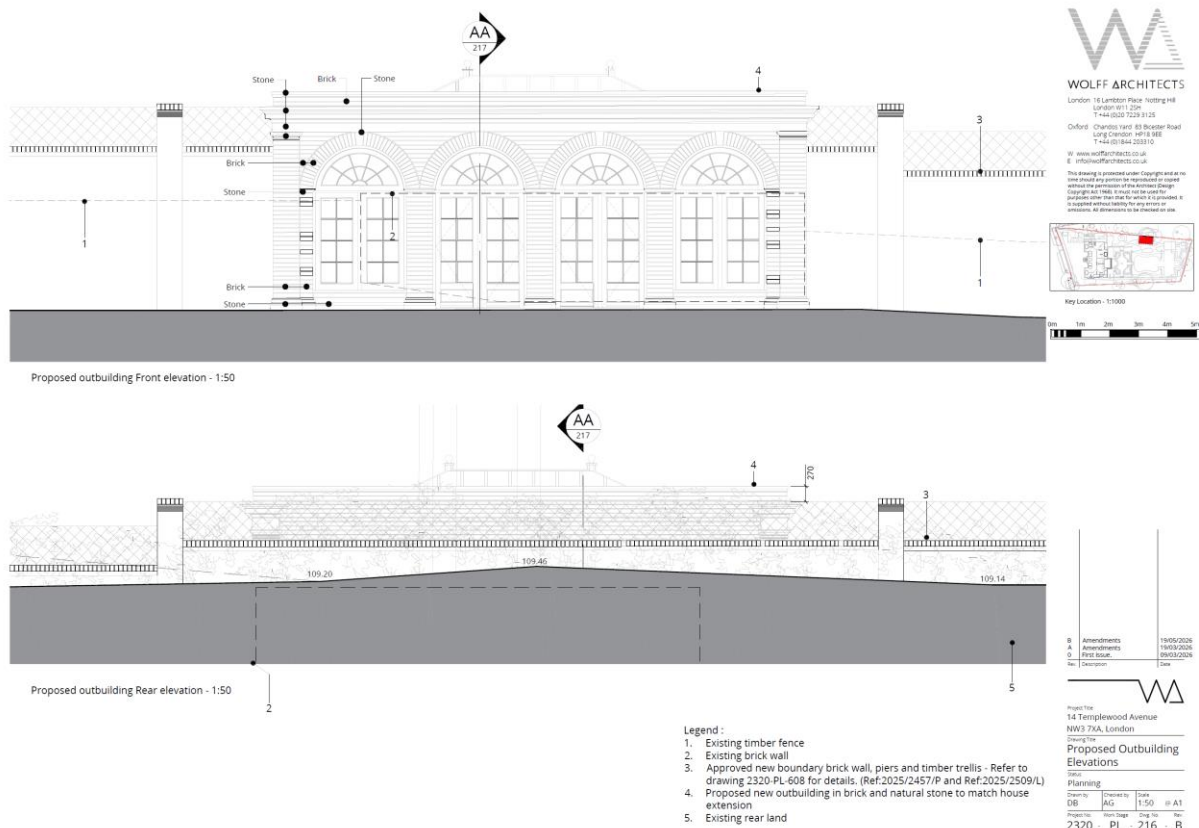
Proposed front and rear elevation of the outbuilding (Source: submitted documents)
